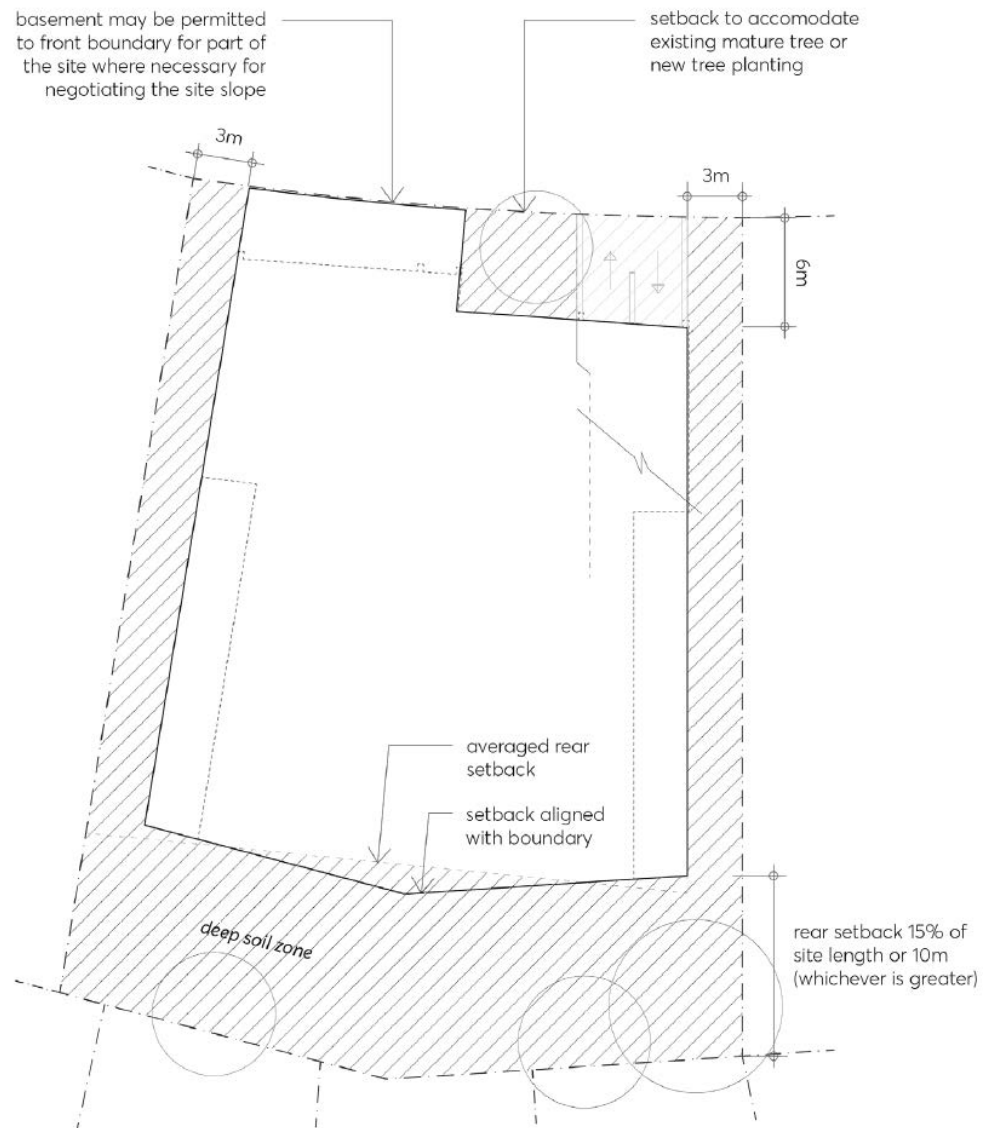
Indicative Basement and Deep Soil Plan
